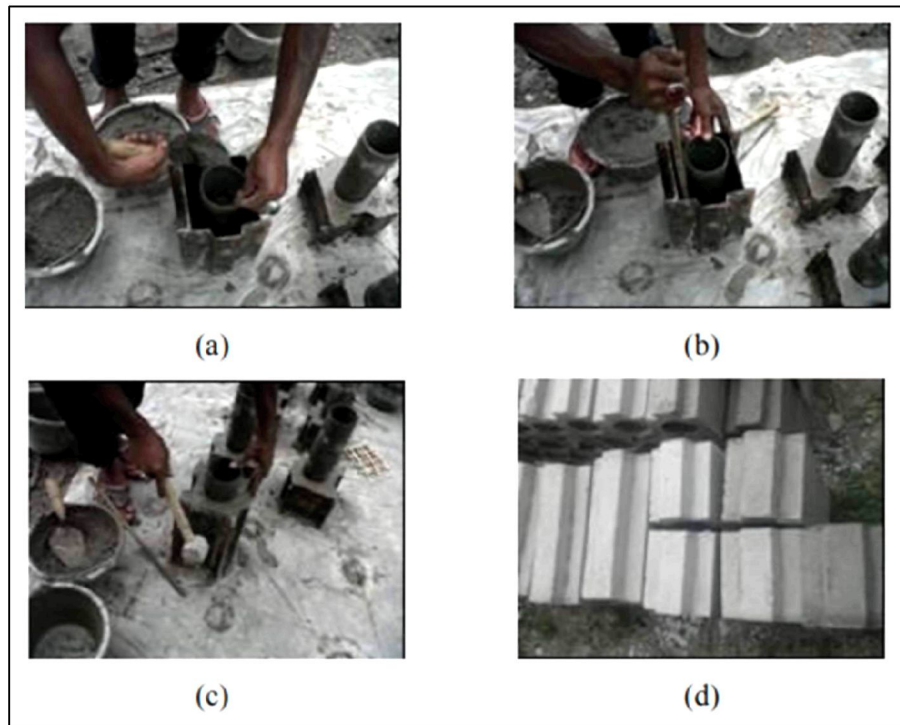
Hollow Core Concrete Brick Making Processes; (a) Pouring Mixture to The Mould, (b) Solidifying the Mixture, (c) Hitting the Surrounding Outer Part of The Mould, (d) Hollow Core Concrete Bricks
